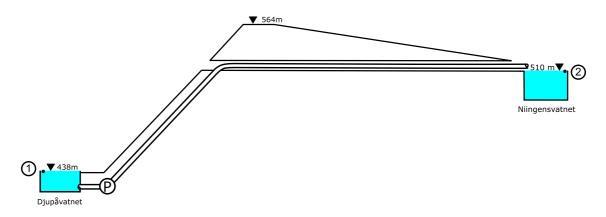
A simplified side-view illustration shows the lengths and elevations of the pumping plan from Djupåvatnet to Niingensvatnet with a tunnel
